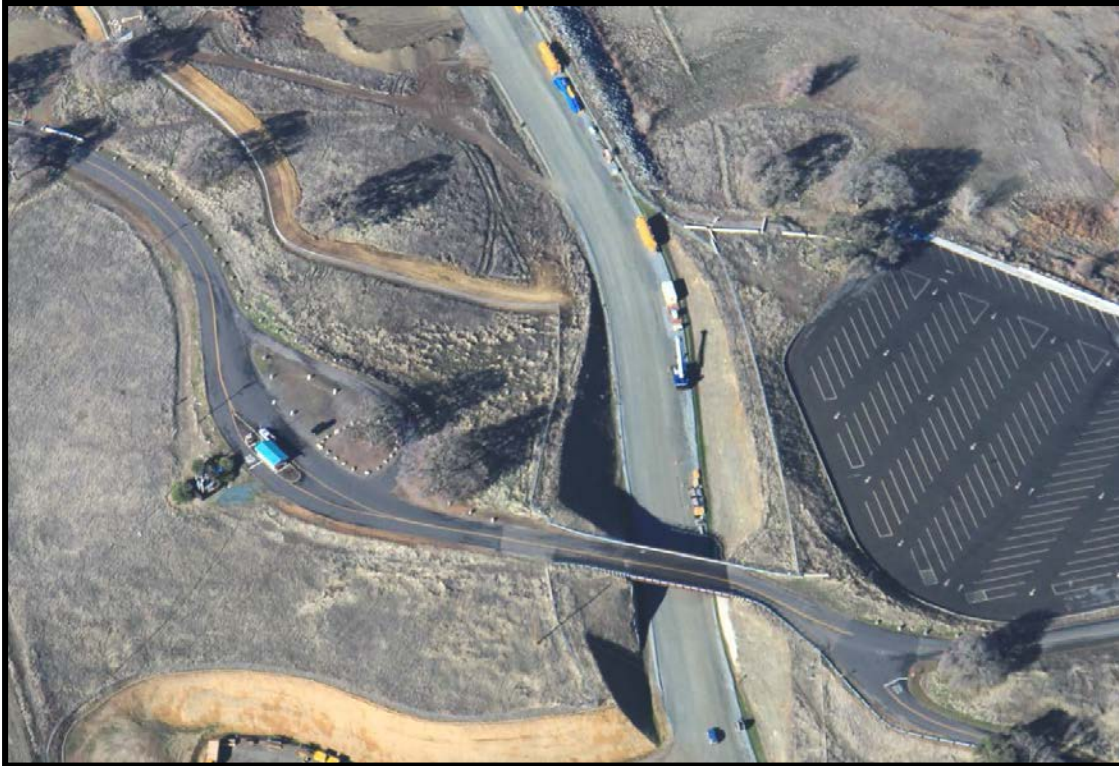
Temporary Folsom Point access bridge crossing over the interior haul road. View from the east side of bridge looking west. Paved road is Folsom Point Road, the primary access road to the Folsom Point boat launch (parking lot visible) and the Folsom Point day use area.
